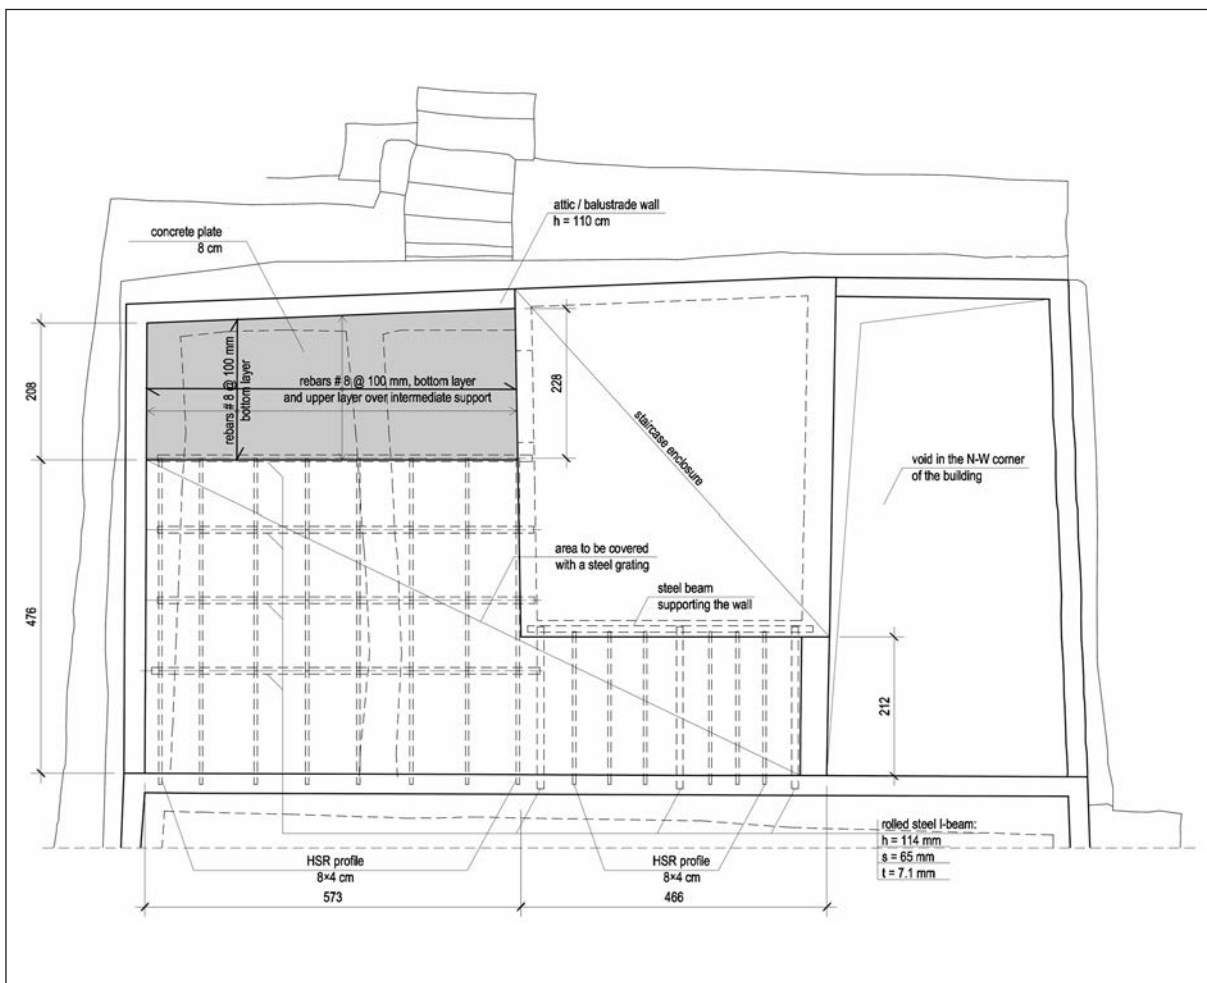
Detailed arrangement of structural elements on the roof in the western part of the building, near the stairwell
